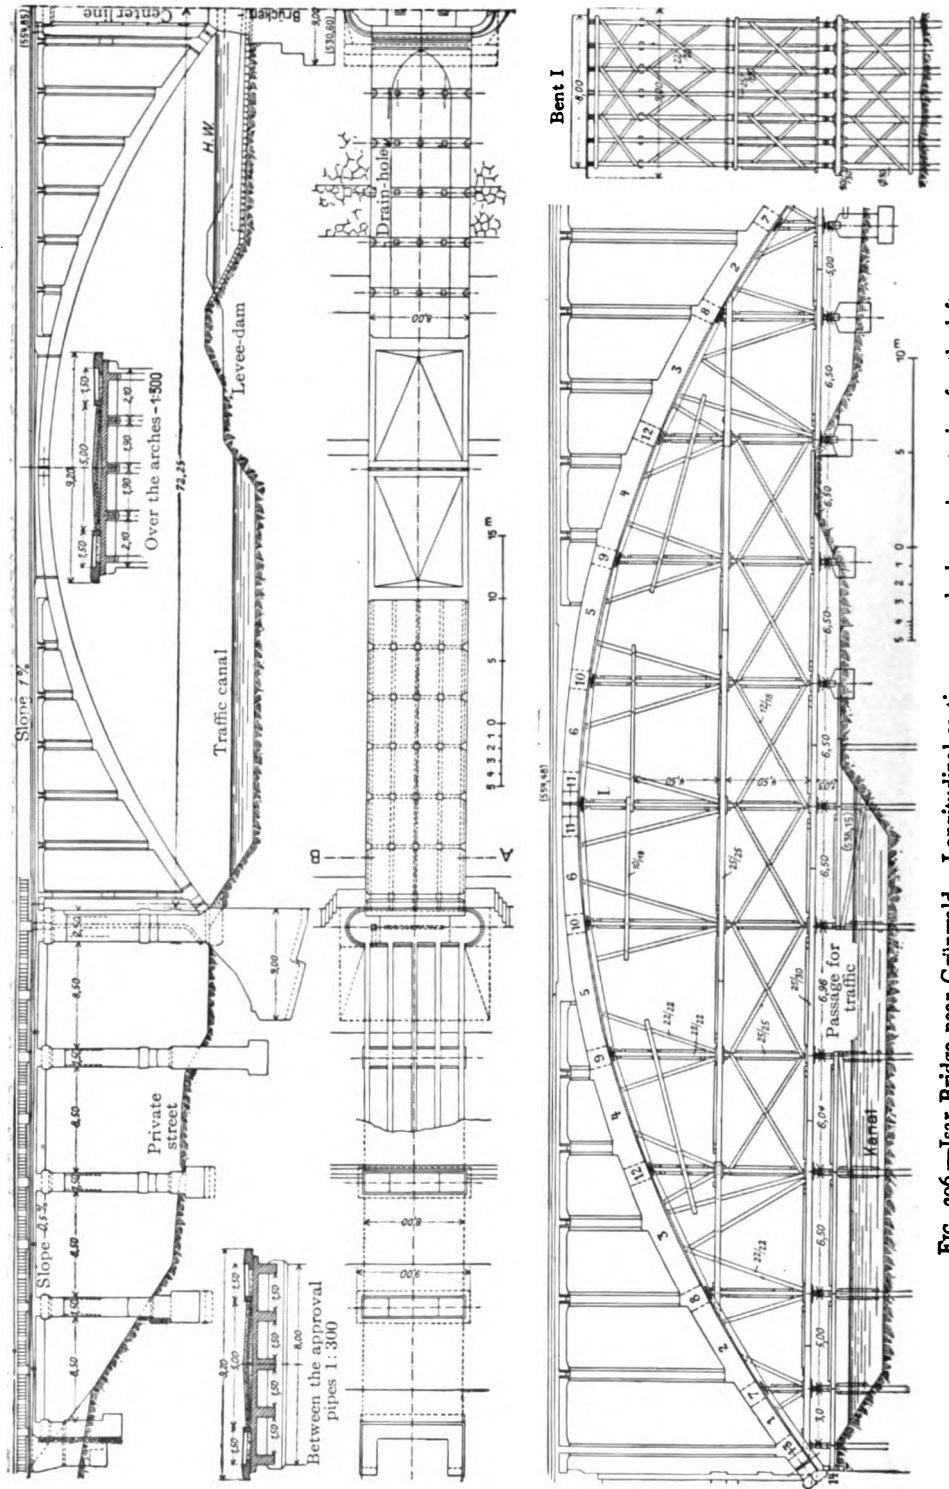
Isar Bridge near Grünwald. Longitudinal section, ground plan and centering for the left span.
